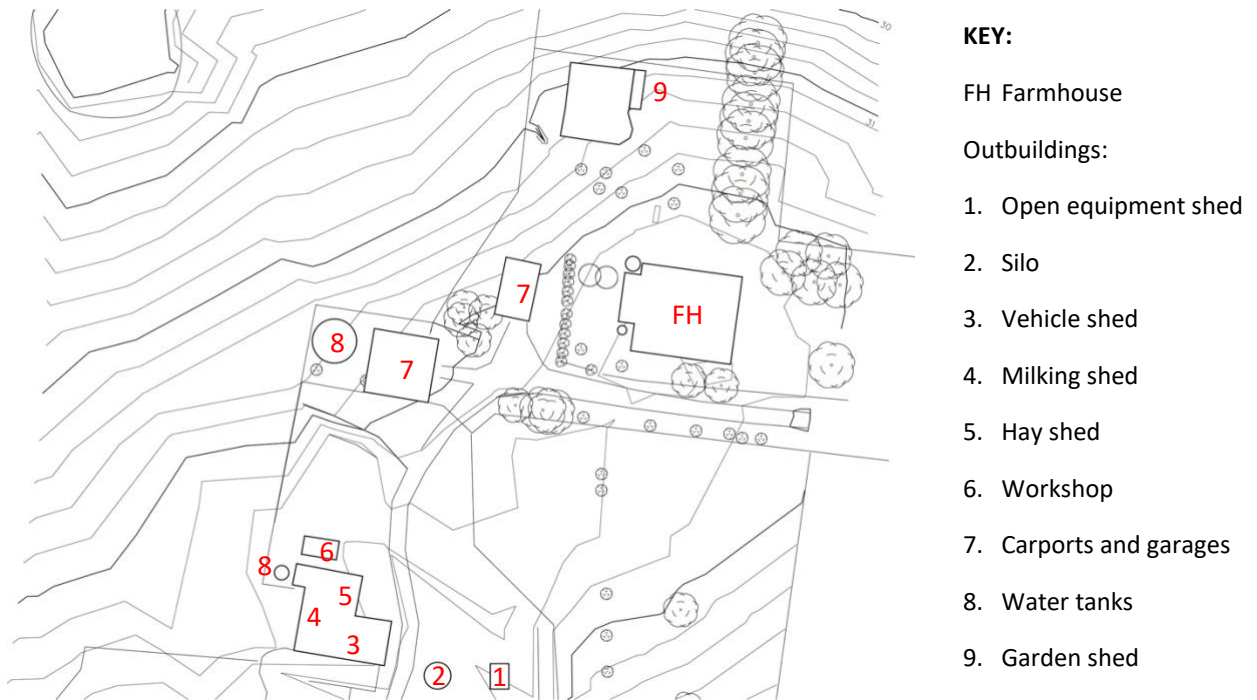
Site Plan showing structures (adapted from drawings prepared by Leah Lloyd-Smith Architect)
